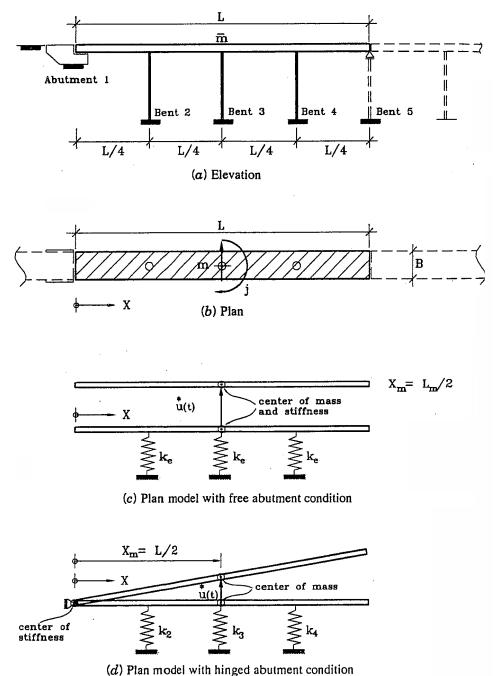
Multi Bridge Frame (Priestley et al, 1996)
